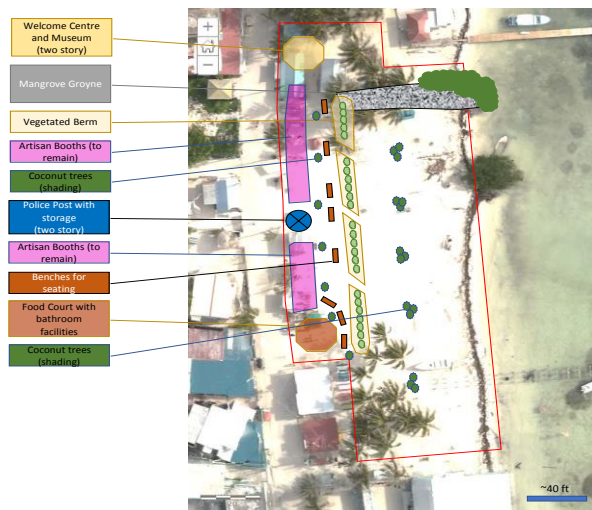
Draft layout of coastal protection works taking into account the village Council proposal for a new Artisan Center at the Palapa Gardens' area
